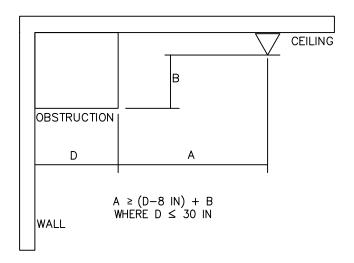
(B) OBSTRUCTIONS AGAINST WALL (RESIDENTIAL UPRIGHT AND PENDENT SPRAY SPRINKLERS)
